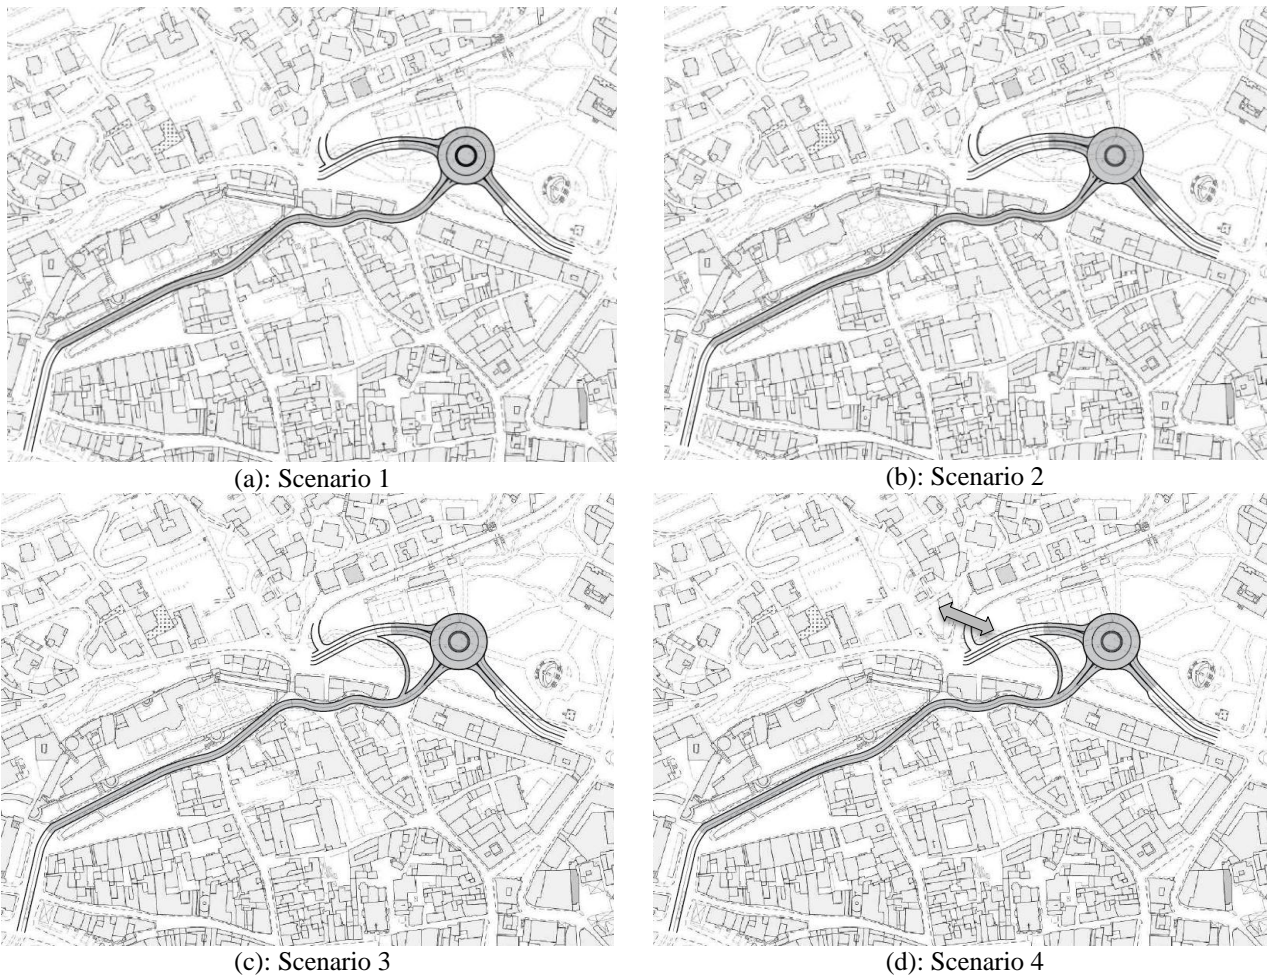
Underground roundabout layouts (the roundabout is placed 6.5 meters below the existing road surface).
